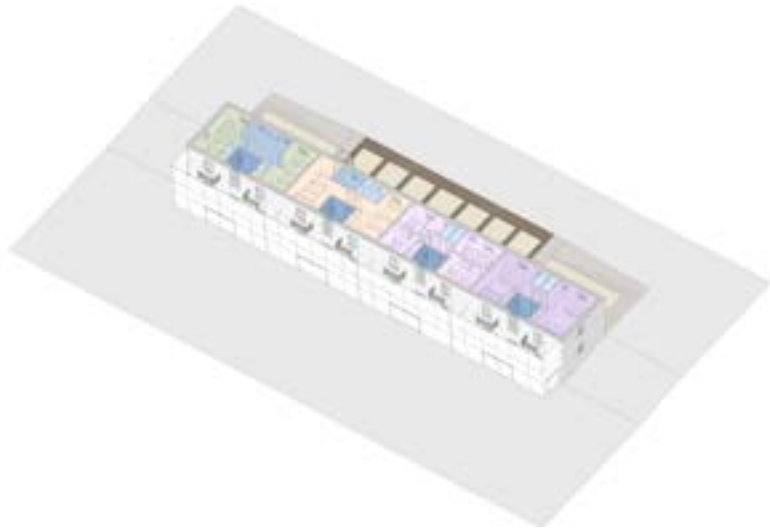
Author (2022). Space Plan & Facilities - 1st Floor [Drawing].
